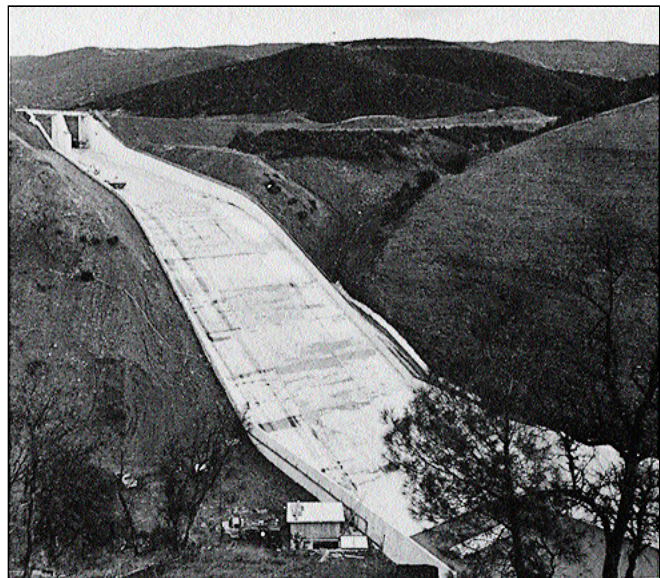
Approximately 60 feet wide and 300 feet long, this dam spillway slopes at a 46 degree angle. It did not meet specifications for slab smoothness but was ground into tolerance with diamond blades.
